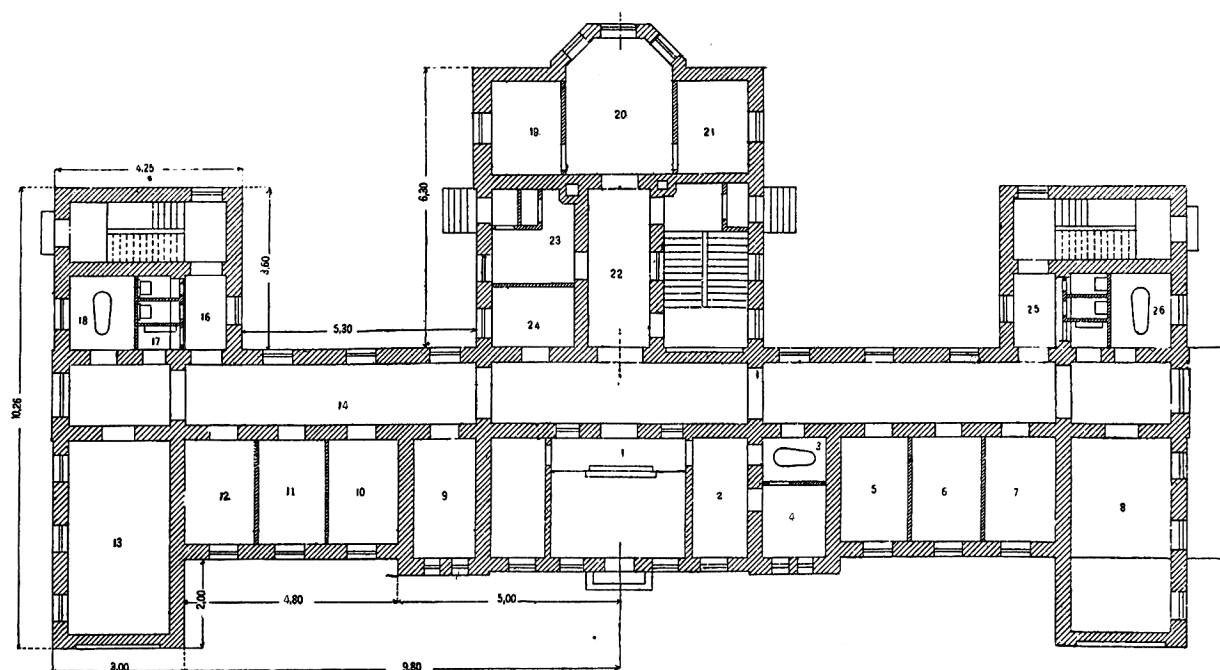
Hospital at the Aleksandrovsky plant of the Nikolaev railway. 1st floor plan [24]
